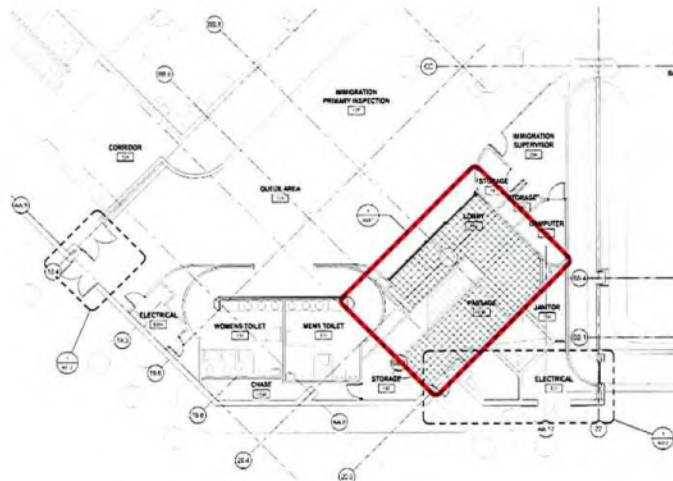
FIS FIRST LEVEL FLOOR PLAN
